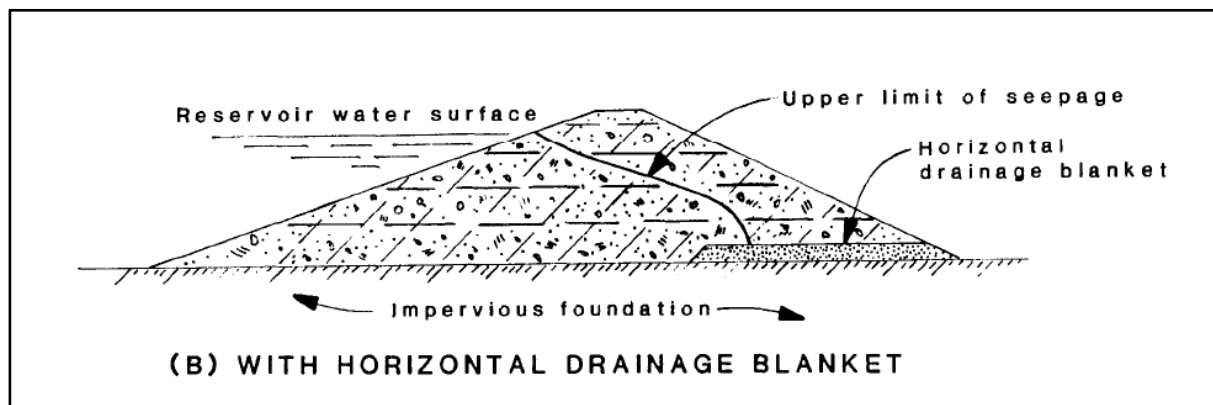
Example of a horizontal drainage blanket in an embankment dam (Source: USBR 1987)
